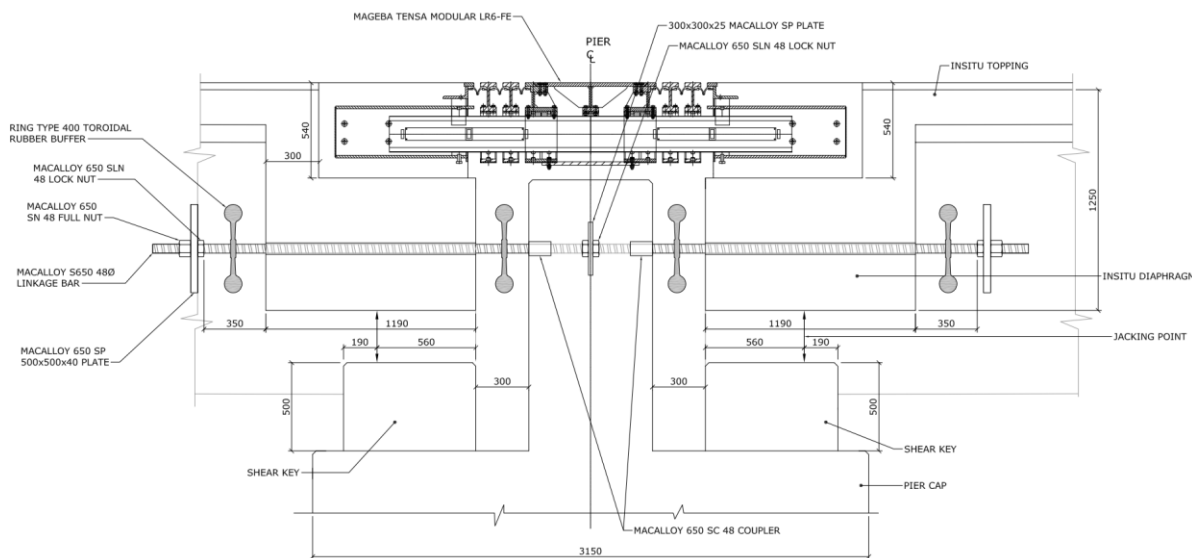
MAGEBA Tensa Modular LR6-FE on Moutoa Floodway Bridge
